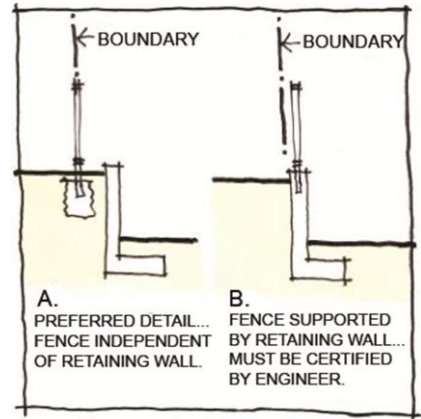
Acceptable retaining walls where constructed in conjunction with fencing (4.9)
